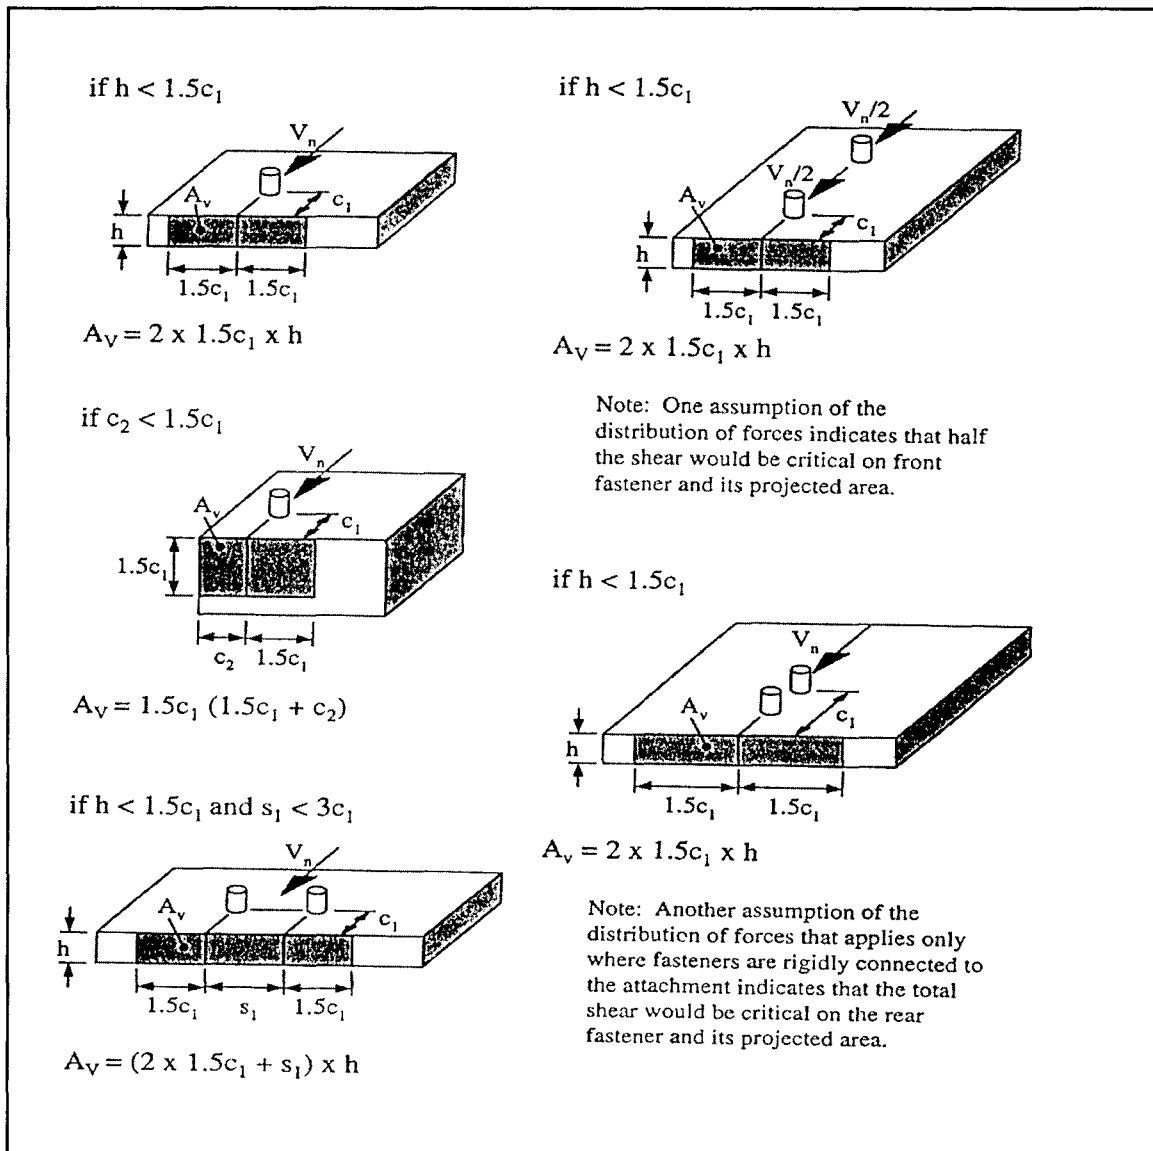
Projected areas for single anchor and groups of anchors.
